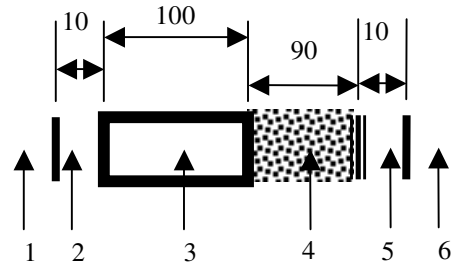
Cross section of a wall construction #3 without the second layer of bricks (all dimensions in mm)
